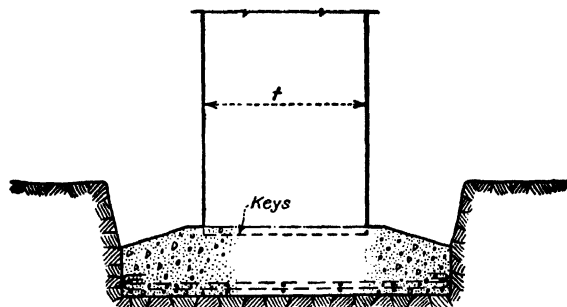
Possum Kingdom Dam. Section through footing (shale).
